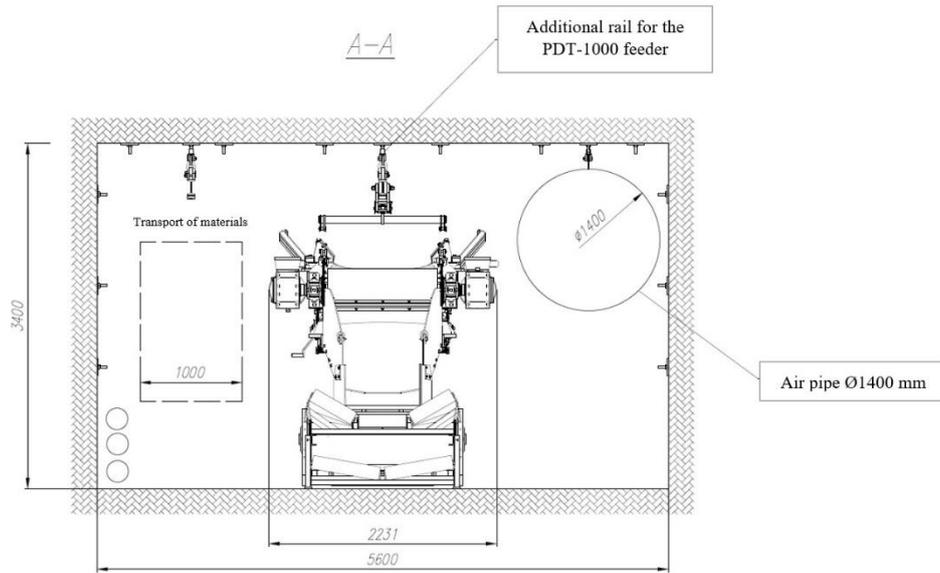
Cross-section of the working with installed air pipe Ø1400 mm [135]
